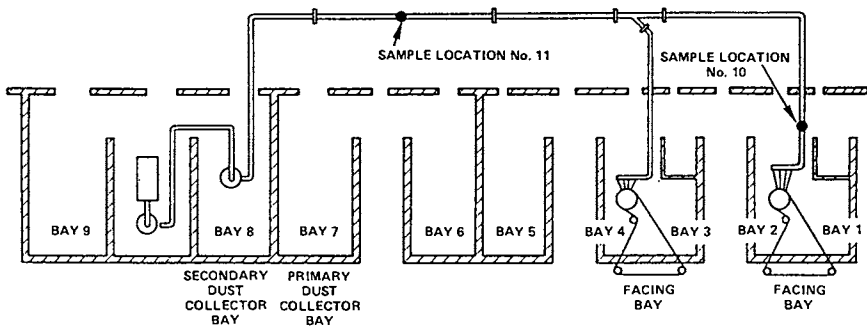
Vacuum exhaust ducting and dust collection system for burster facing operation in Building 04-M-40.
